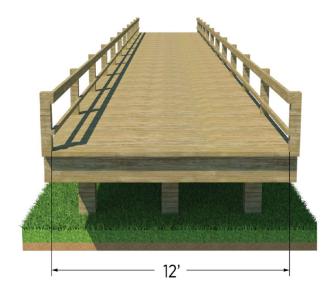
Typical Section for Independent Trail Facility on Boardwalk
